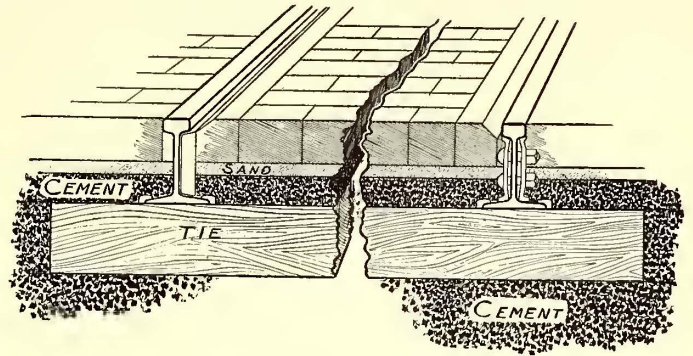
CROSS-SECTION OF T-RAIL PAVED-STREET CONSTRUCTION IN BATTLE CREEK, MICH.
